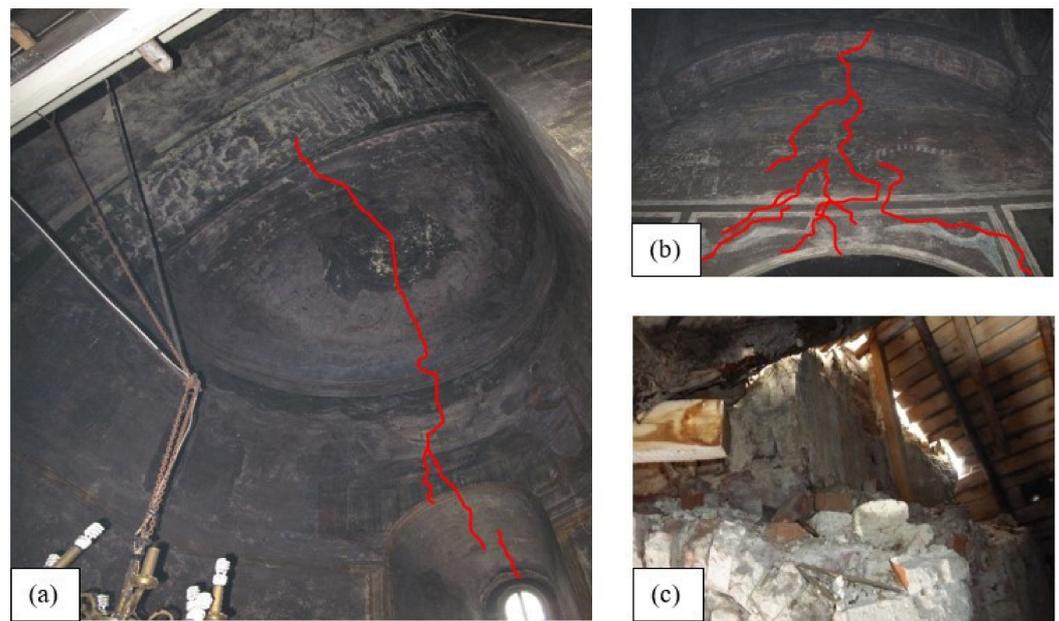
Visual investigations: (a) Continuous cracks between the window and the vault keystone—Sanctuary, (b) Cracks in the transition arch from the entrance in the narthex, (c) Degradations located both in the masonry and the nearby roof timber framing system.
